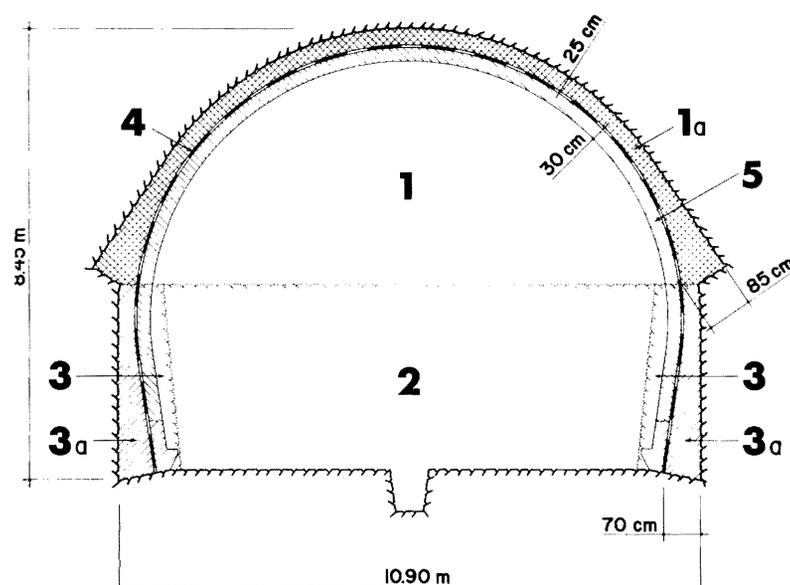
Cross-section of Fonzaley Tunnel. Sequence of excavation and concreting.
